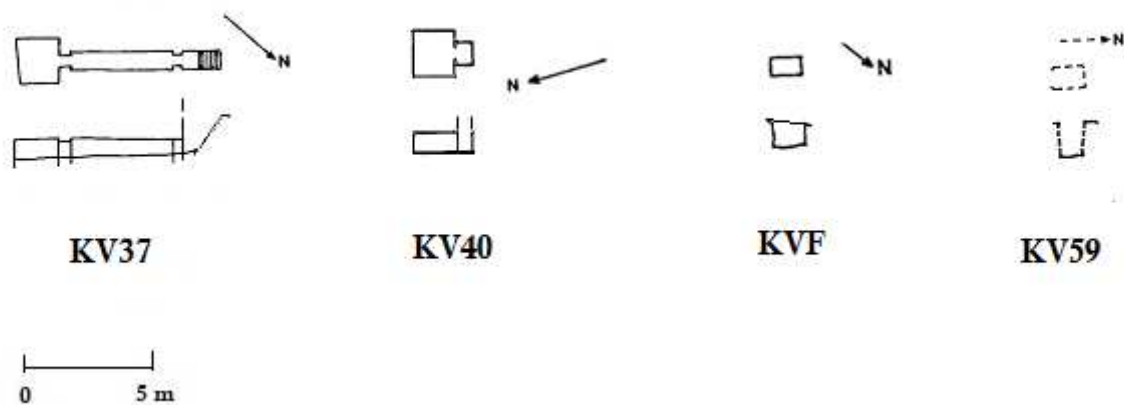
The KV37, KV40, KVF and KV59 plans and sections (drawing web).
